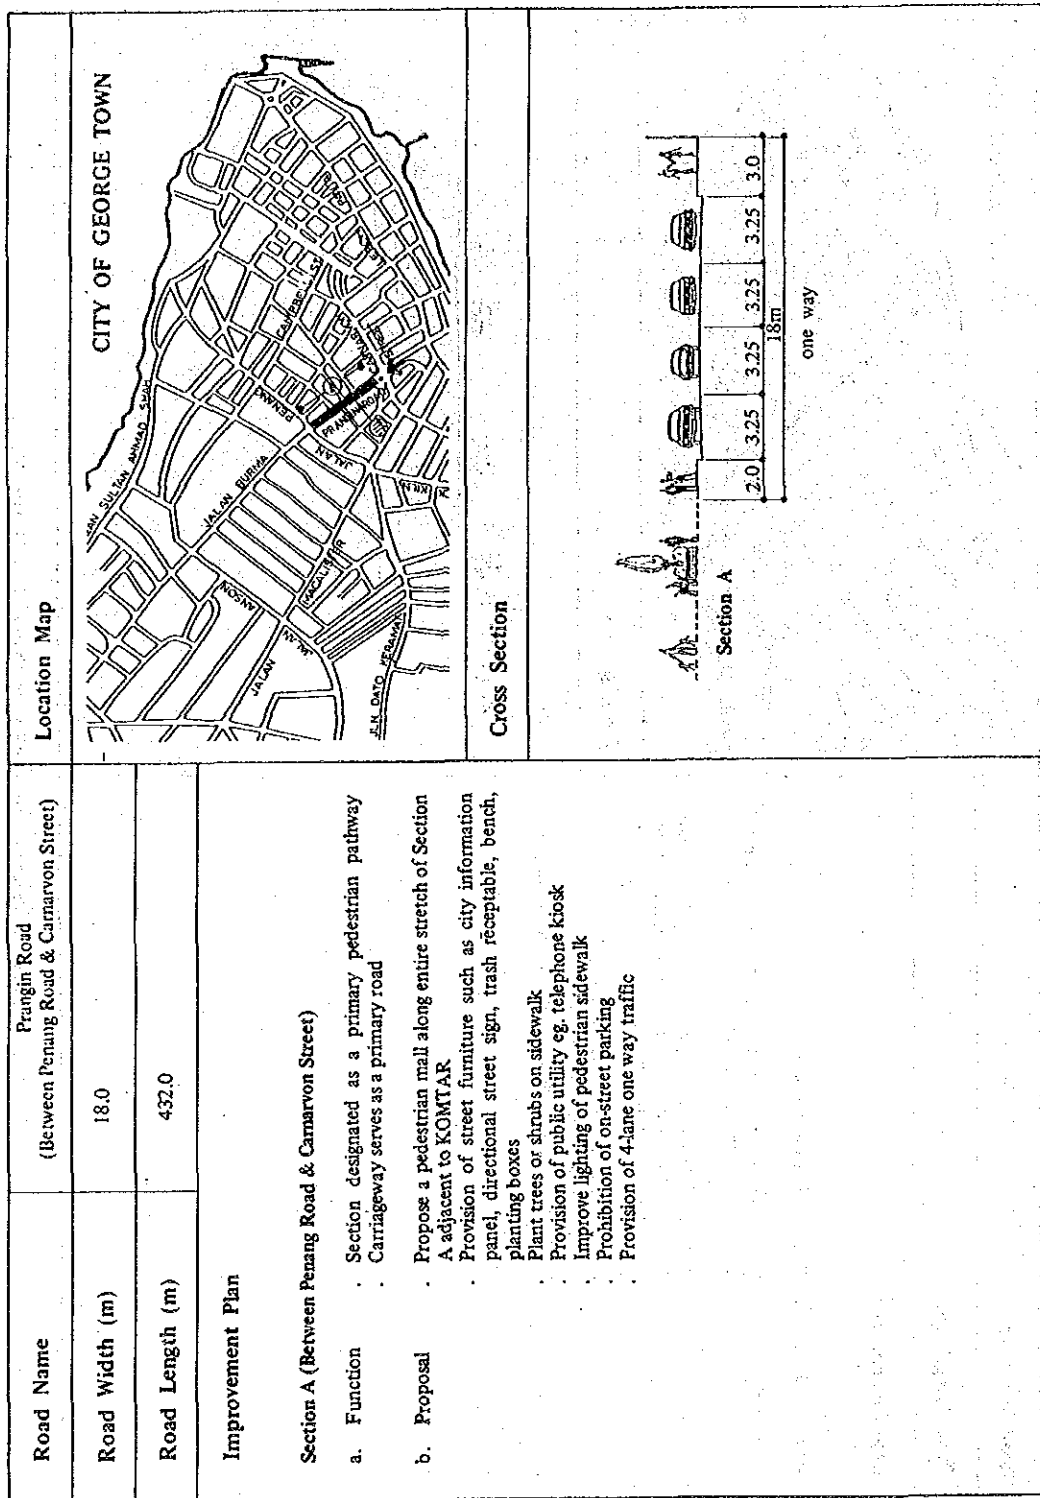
Pedestrianisation Improvement Plan (19) -- Prangin Road
